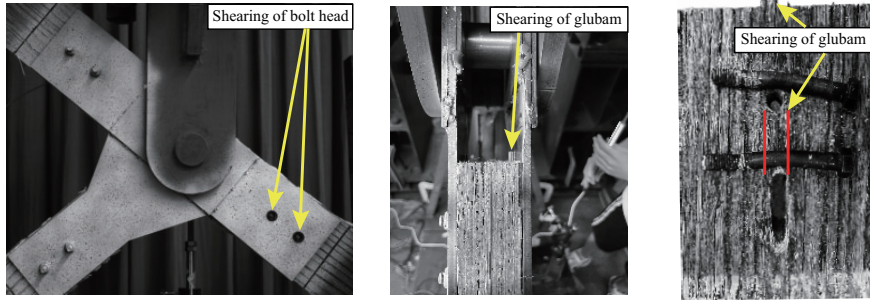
Typical failure pattern of planar roof trusses.
